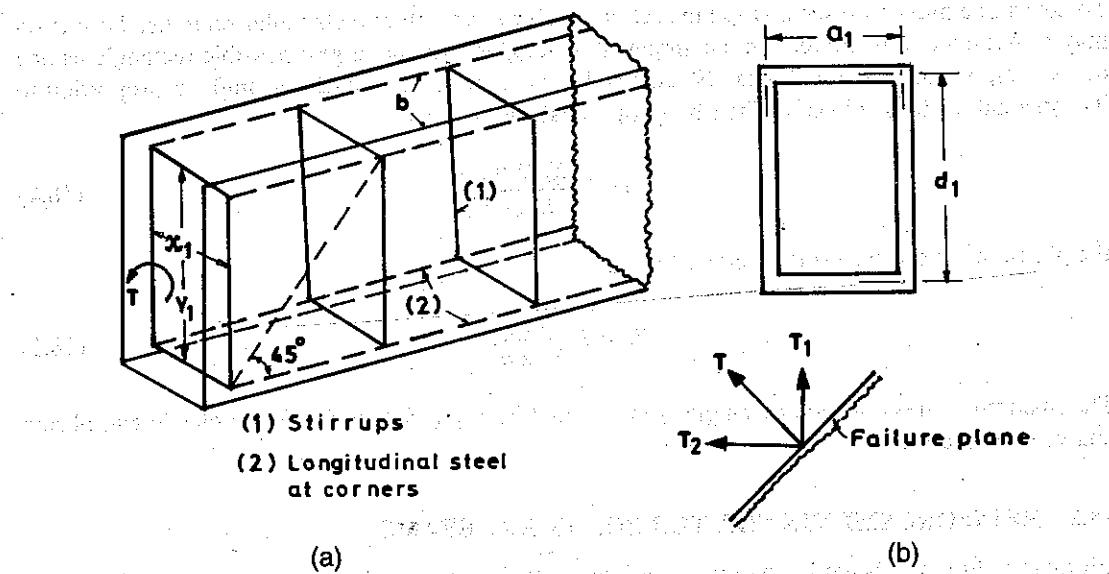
Reinforcement of beams for torsion: (a) Stirrups, (b) Longitudinal steel at corners.
